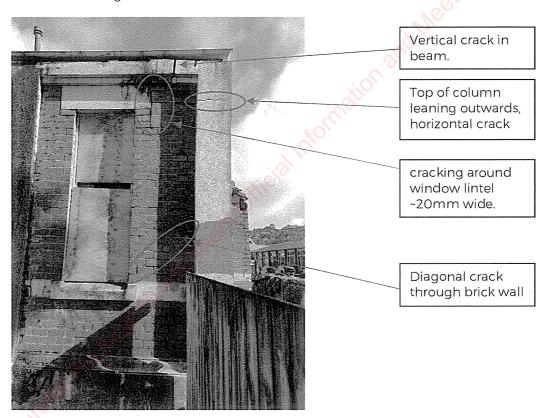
North-East corner of Old Court House showing damage to brick walls
